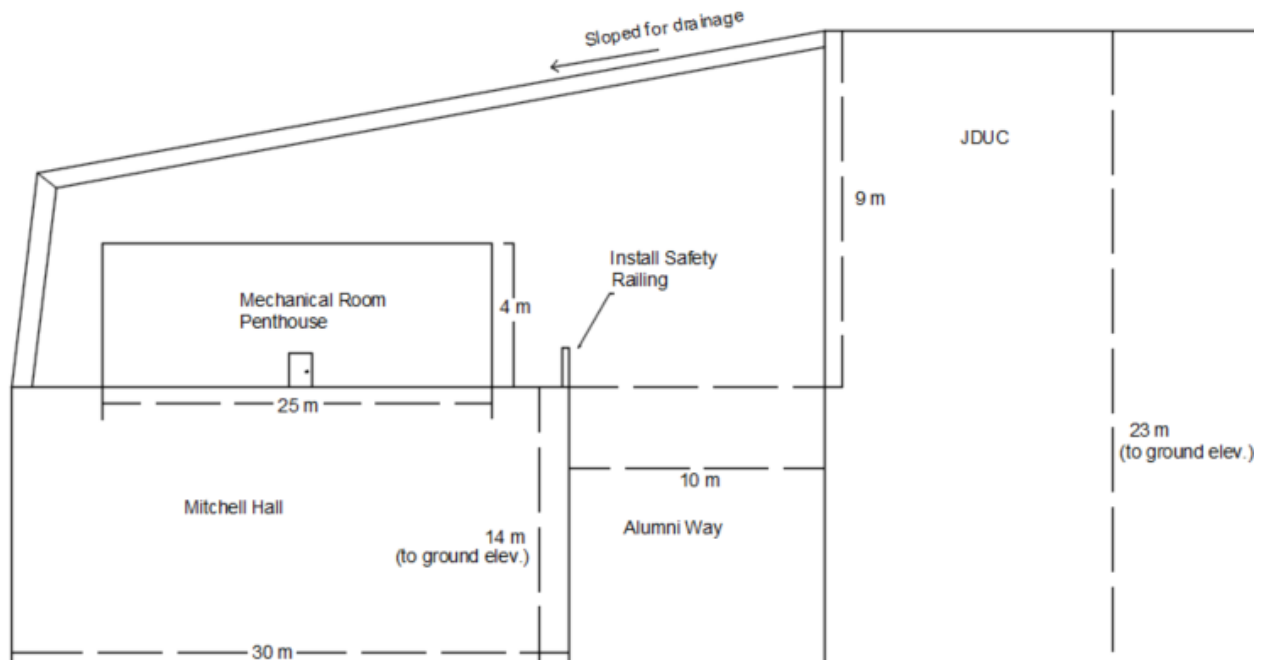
Preliminary Design 1 - Atrium and Rooftop
